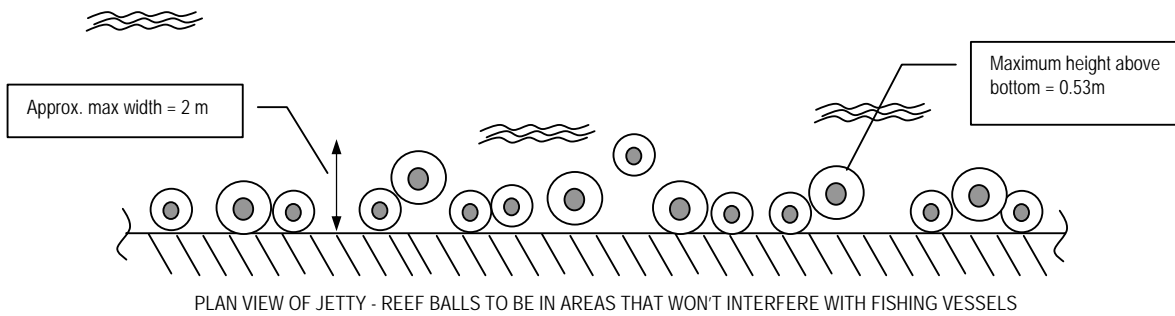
Basic configuration of module groupings to go along base of retaining wall.
